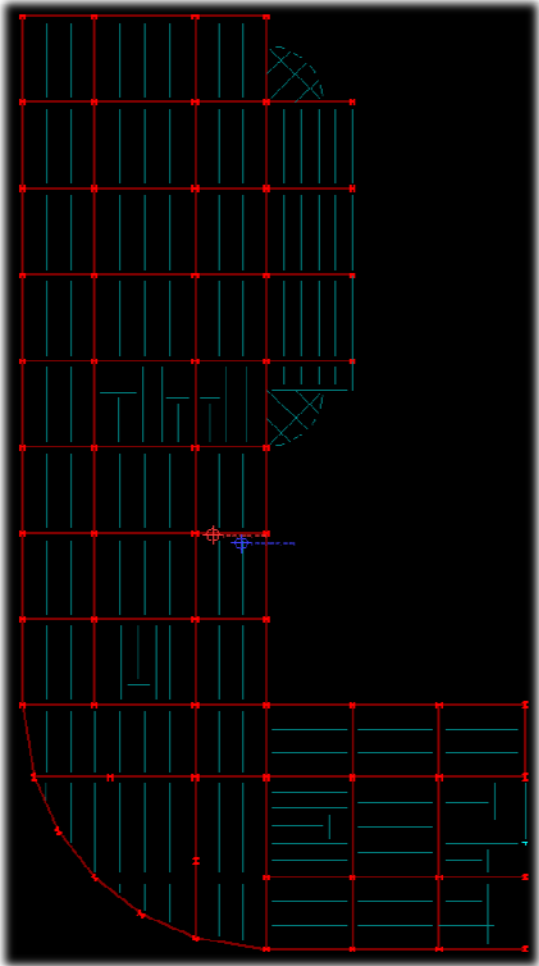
Center of Mass and Rigidity for 3rd Floor and Roof
